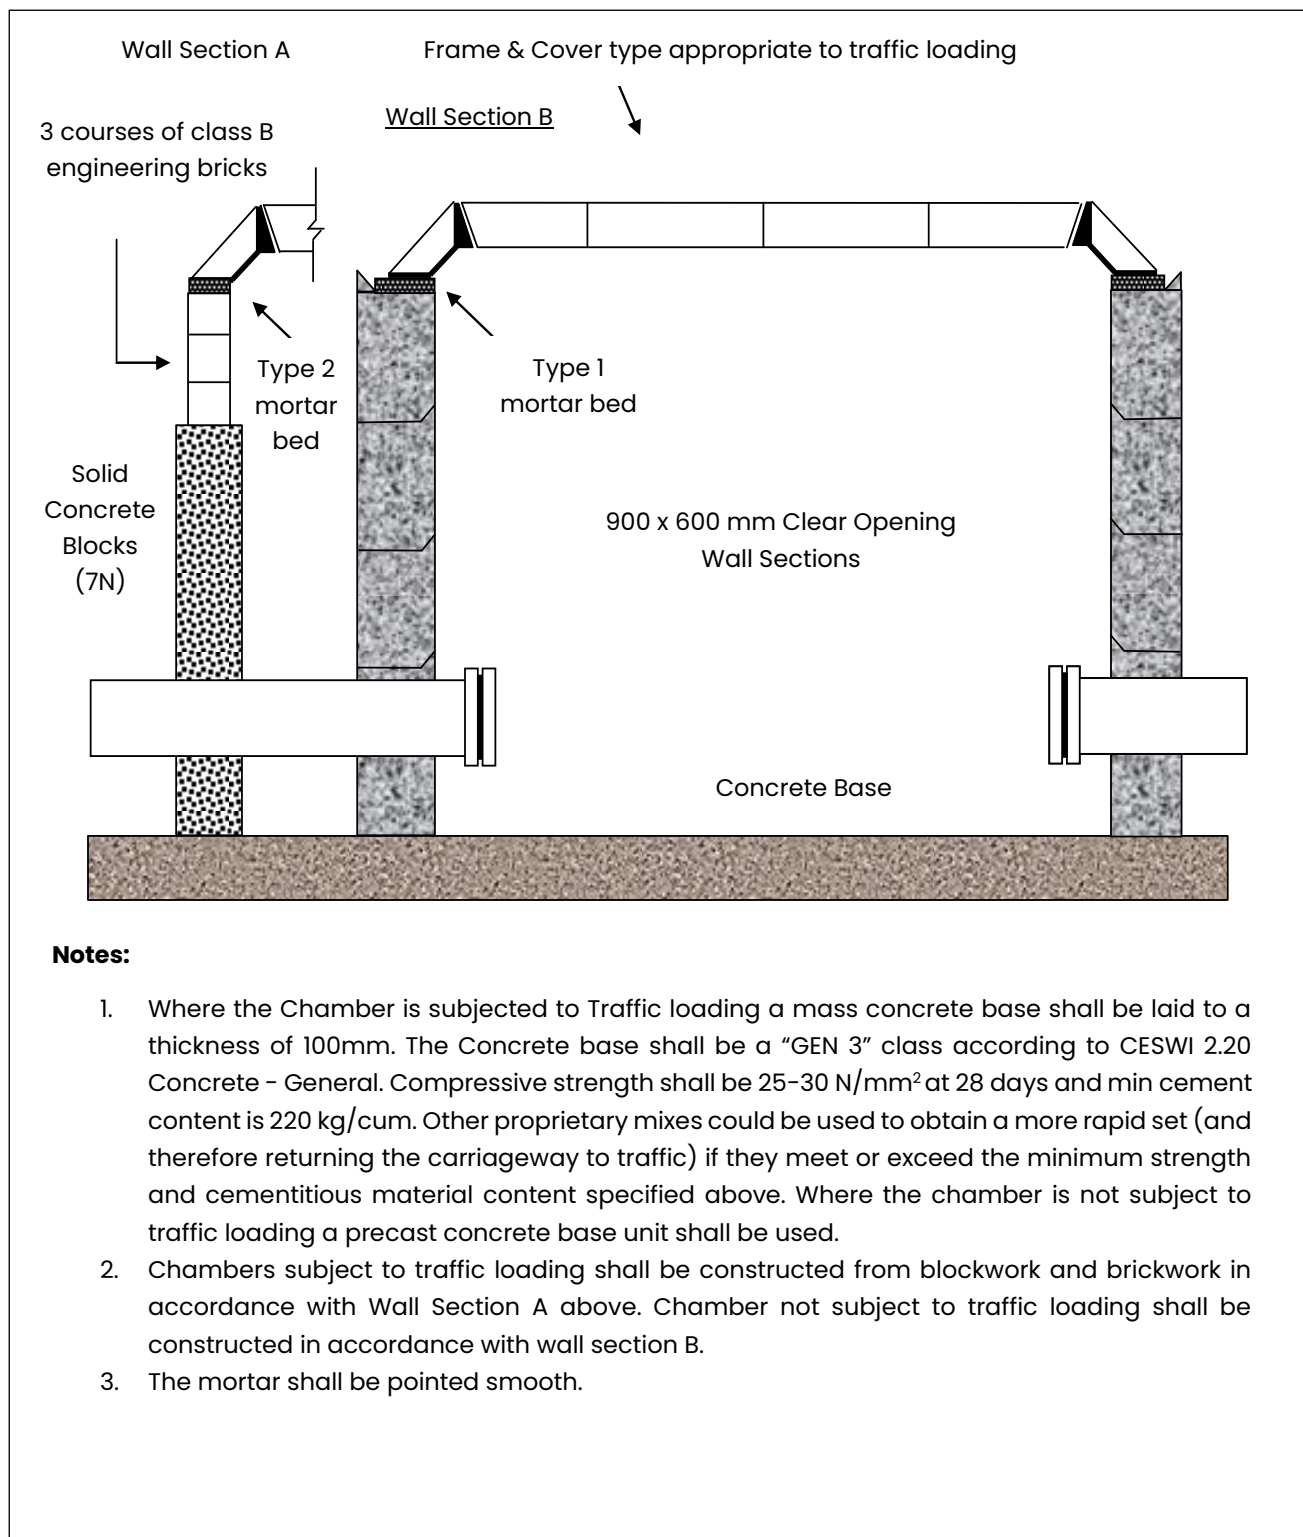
Precast Concrete Chamber with a 900 x 600 mm Frame and Cover
